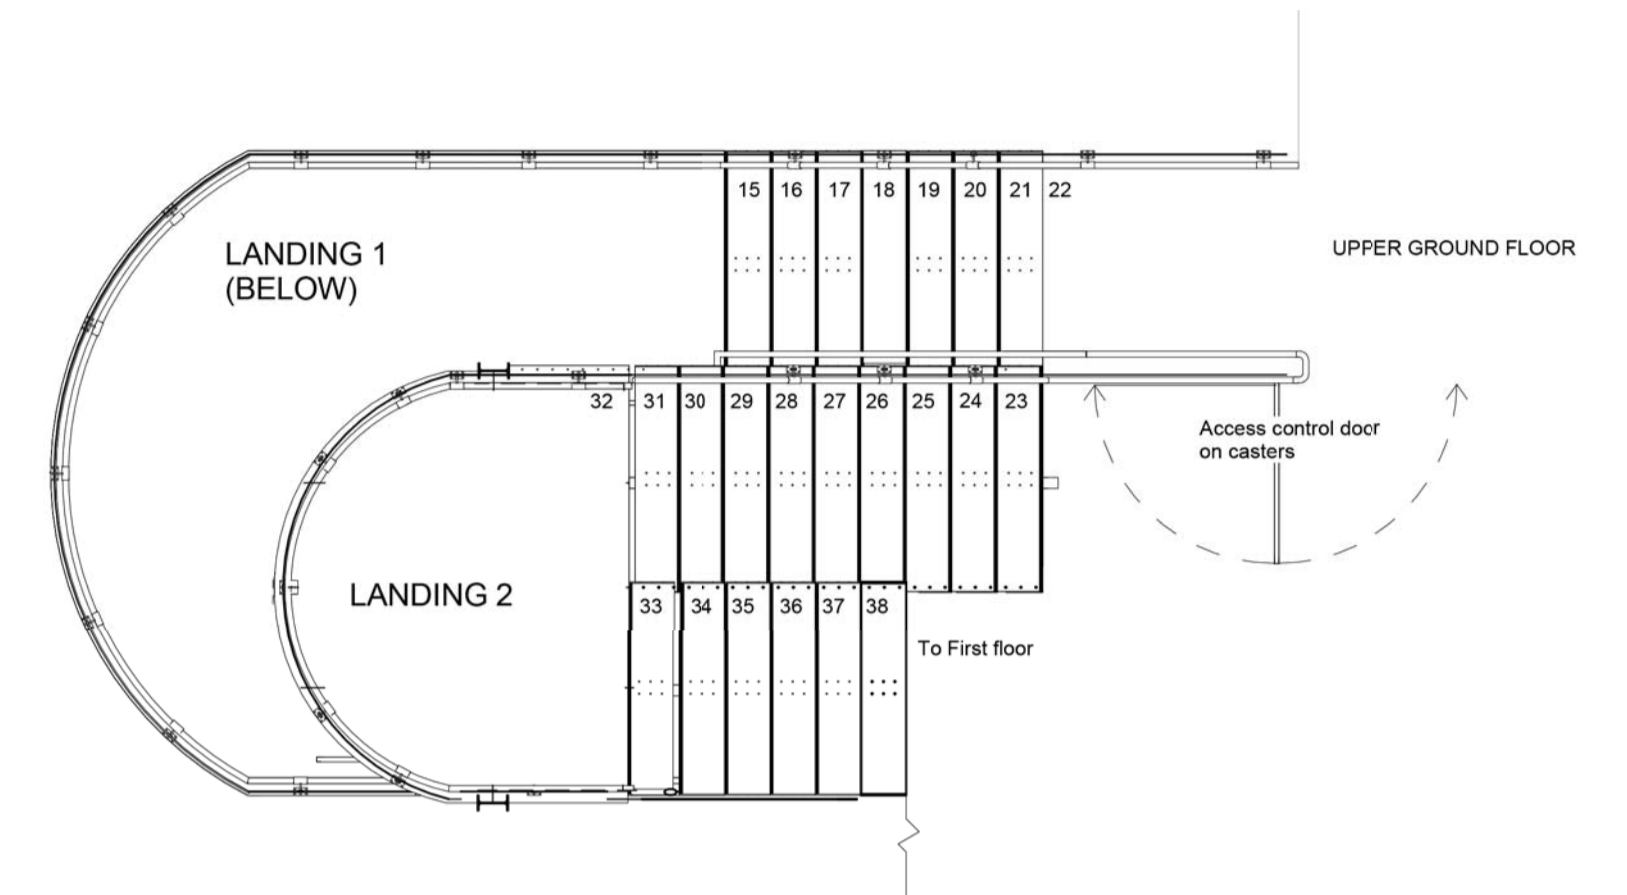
LANDING 2 PLAN SCALE 1:50
